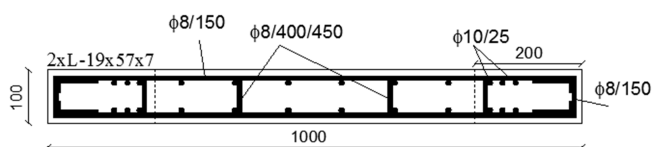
Plan view of the reinforcement layouts of the CSW test specimen (Dimensions: mm)
